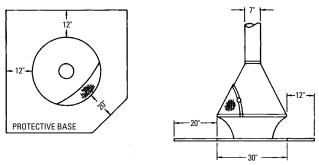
Dimensions of a typical protective base showing clearances of fireplace. (Courtesy Malm Fireplace, Inc.)
